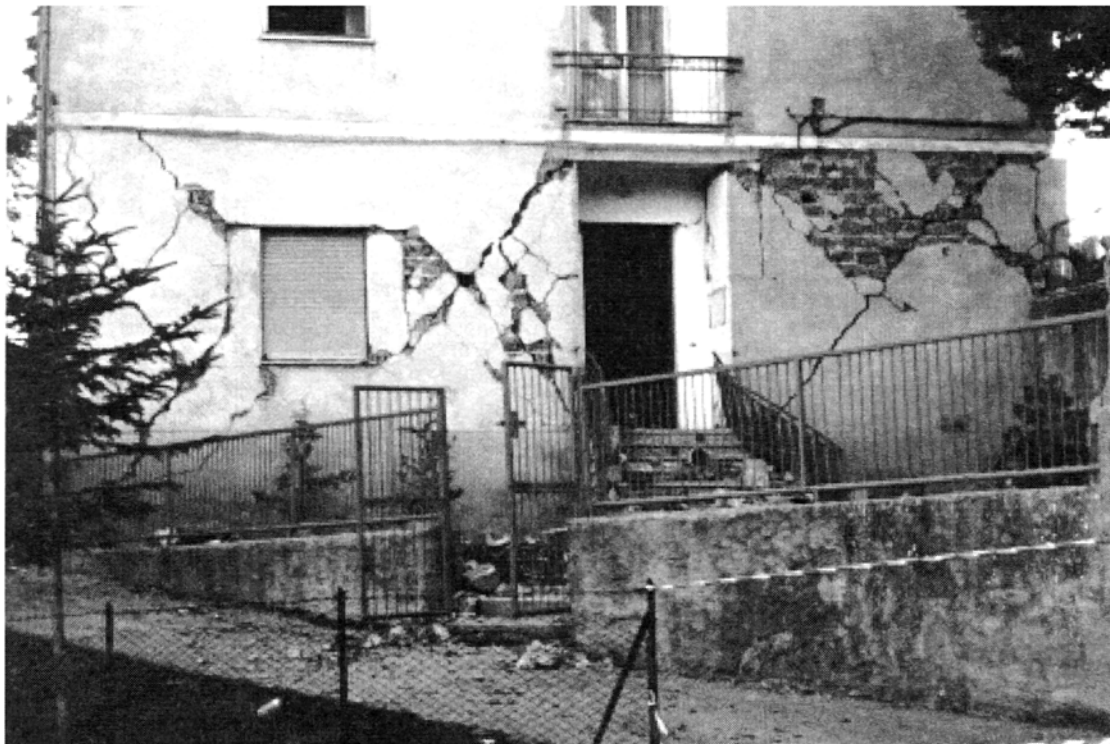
Masonry building with reinforced concrete first floor slab: Annifo
